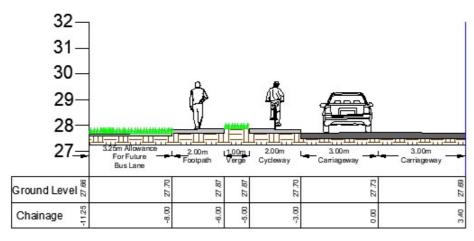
Proposed Upgrade works to the R617- Typical Cross Section
